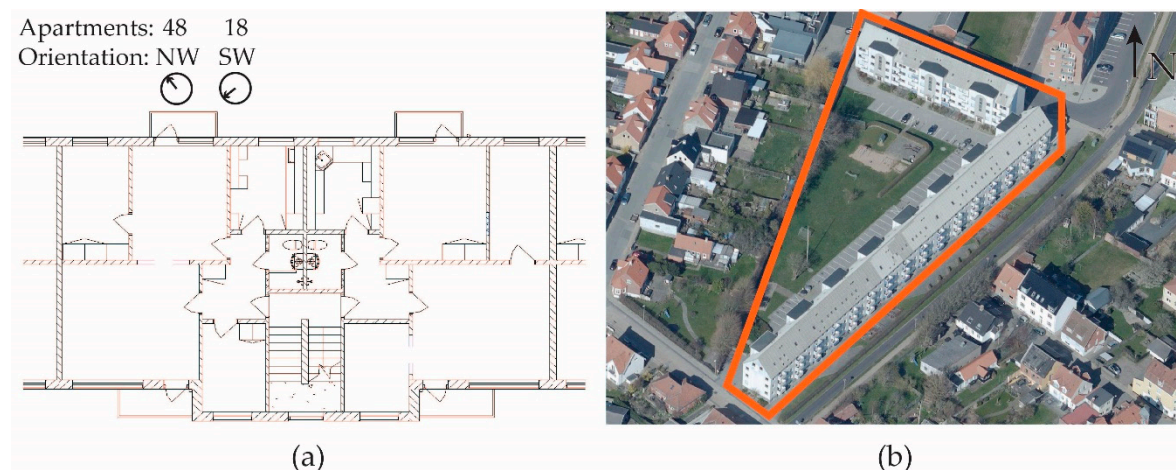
(a) Plan and orientation of the Danish case study building complex; and (b) overview of the building complex and its surroundings.
